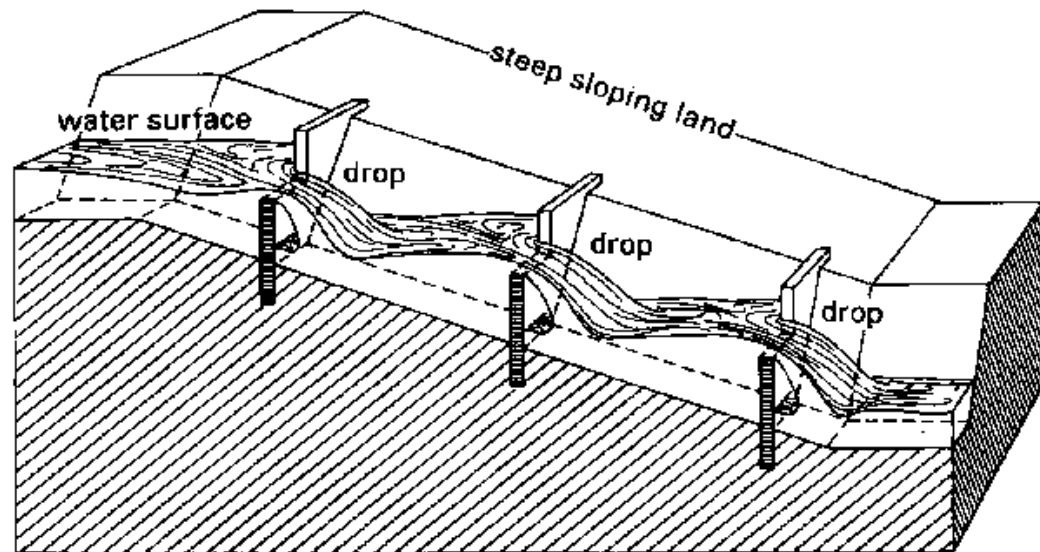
A Sketch Shows a Longitudinal Section in a Steep Slope Land Controlled by Drop Structures (Weirs)
